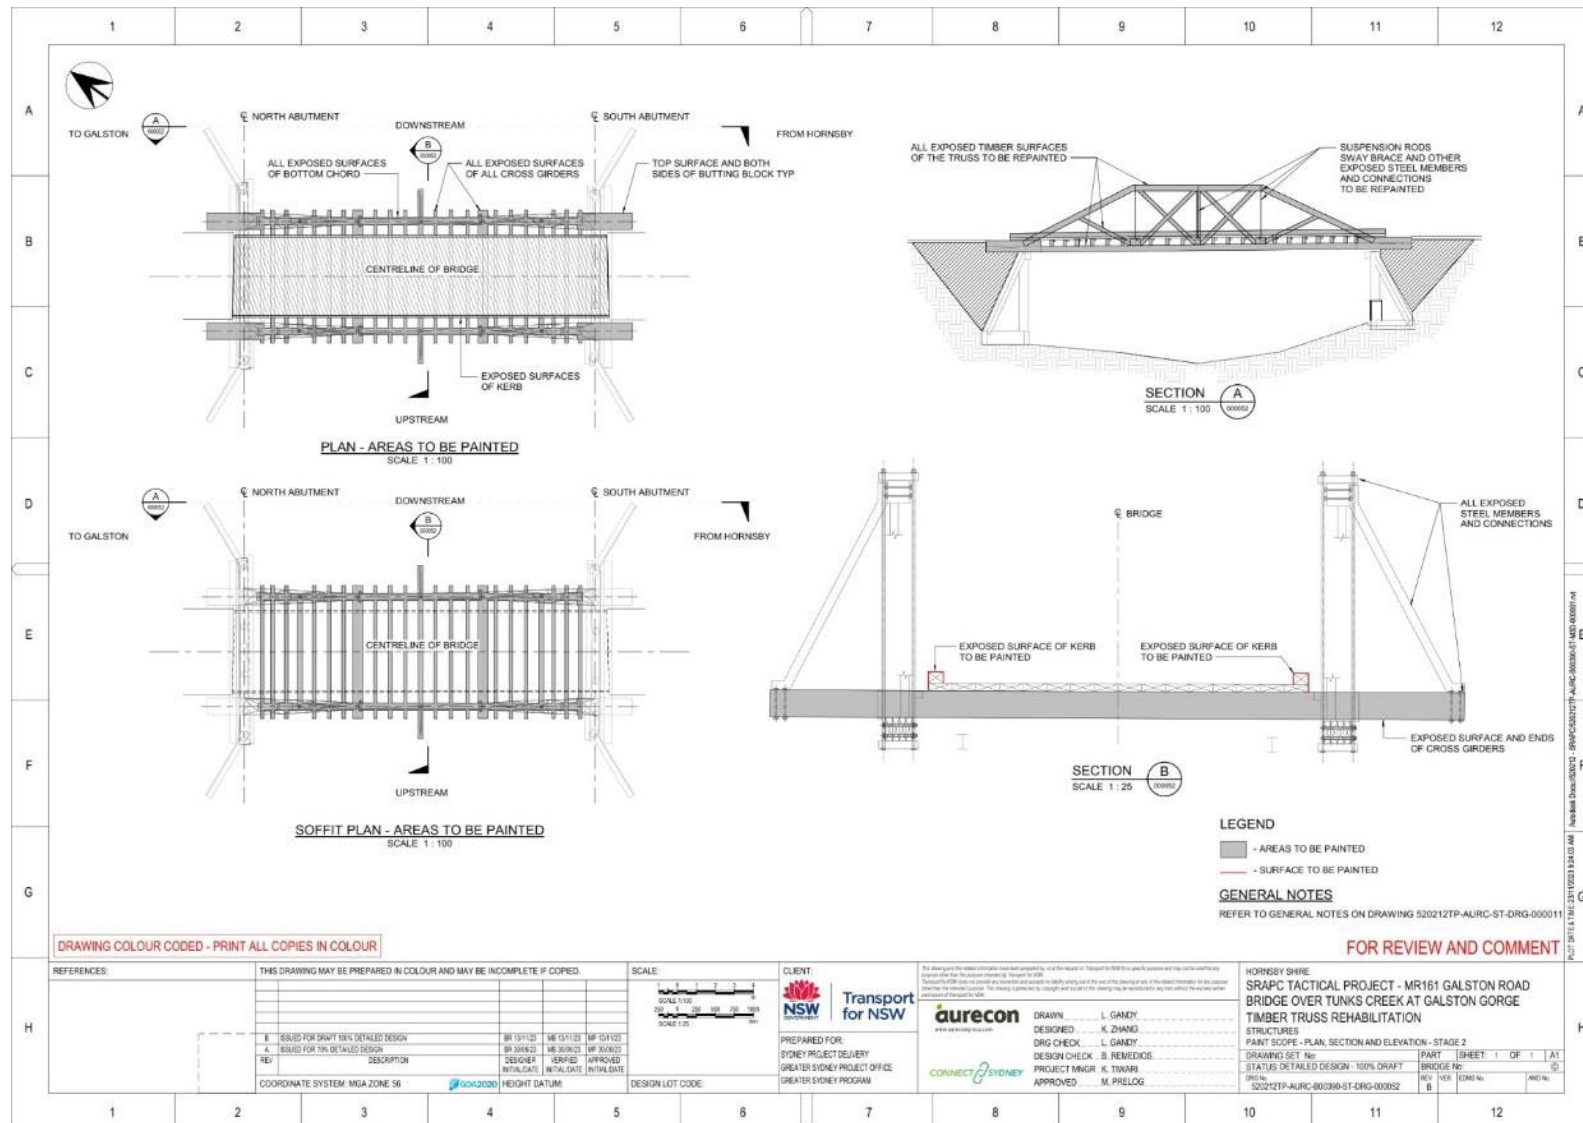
Structures paint scope – plan, section and elevation – Stage 2: 520212TP-AURC-B00390-ST-DRG-000052 (Source: Aurecon)
